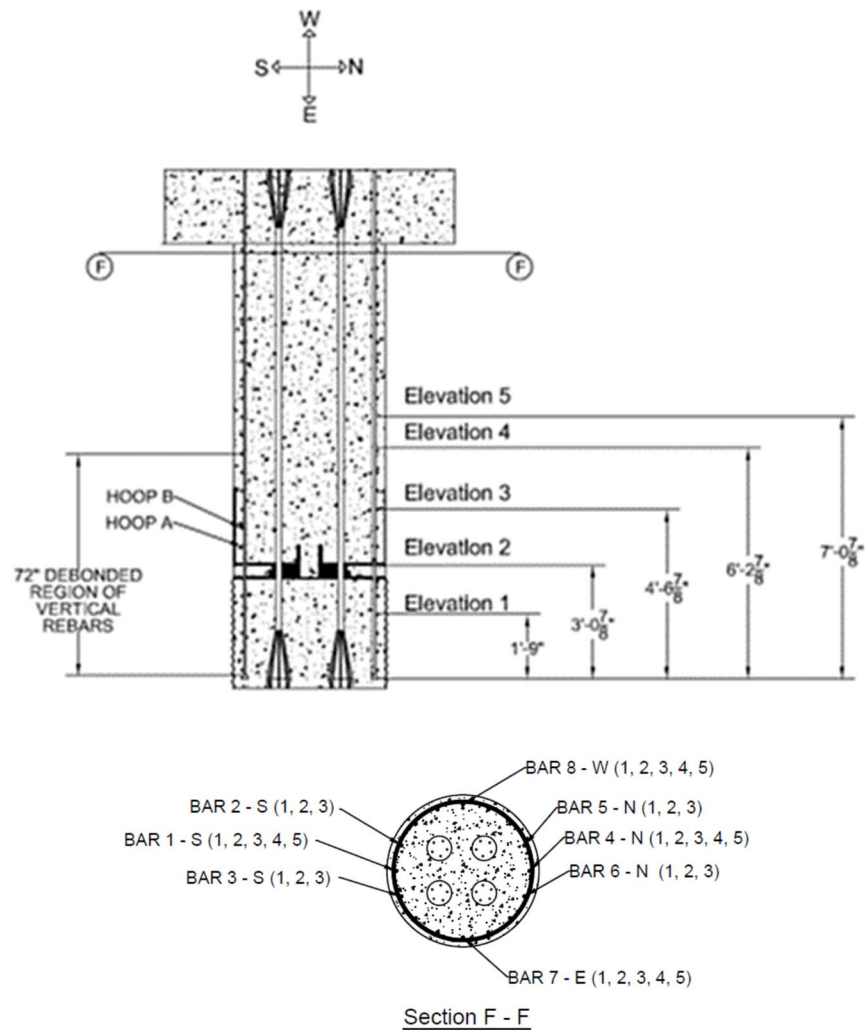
Strain gauge locations on longitudinal rebars for Specimen 1 (loading along N-S direction)
